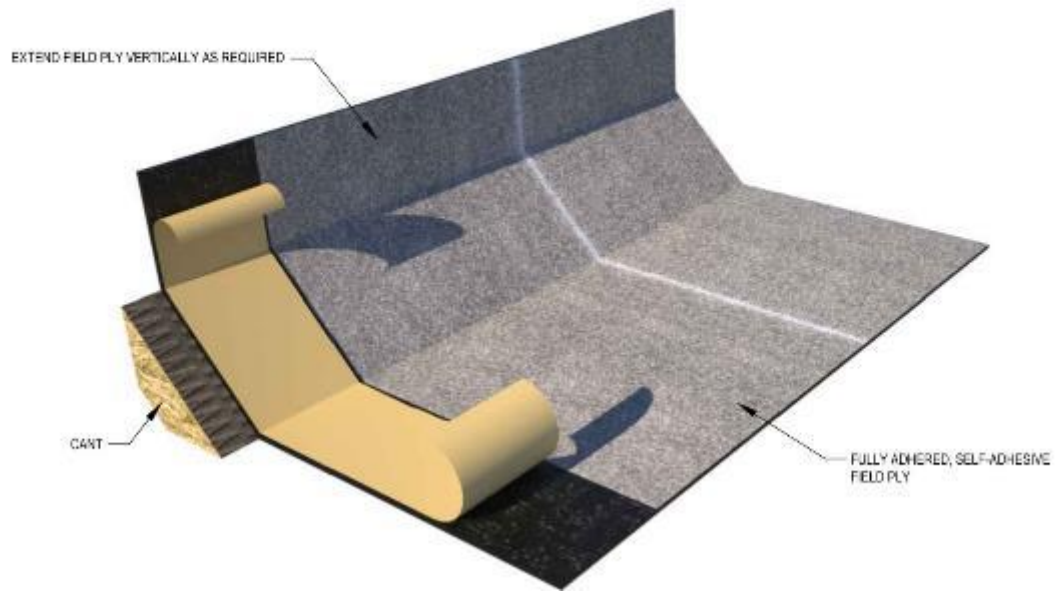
Fully Adhered, Self-Adhesive Vapor Retarder Termination at Wall/Curb With Cant
